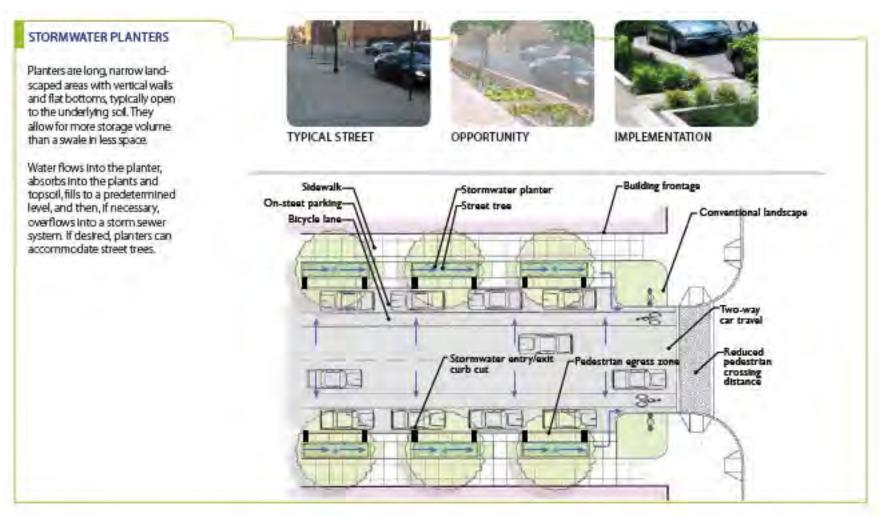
Example Application of Stormwater Planters along a Commercial Street (Source: EPA's 2008 Managing Wet Weather with Green Infrastructure)
